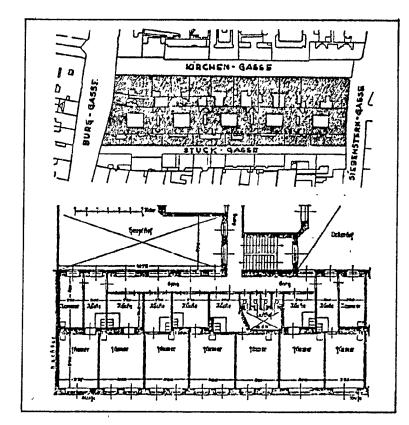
Vienna. Typical dwellings (block plan and floor plan) of the masses, ca. 1900. (Hegemann, 1936-38)
